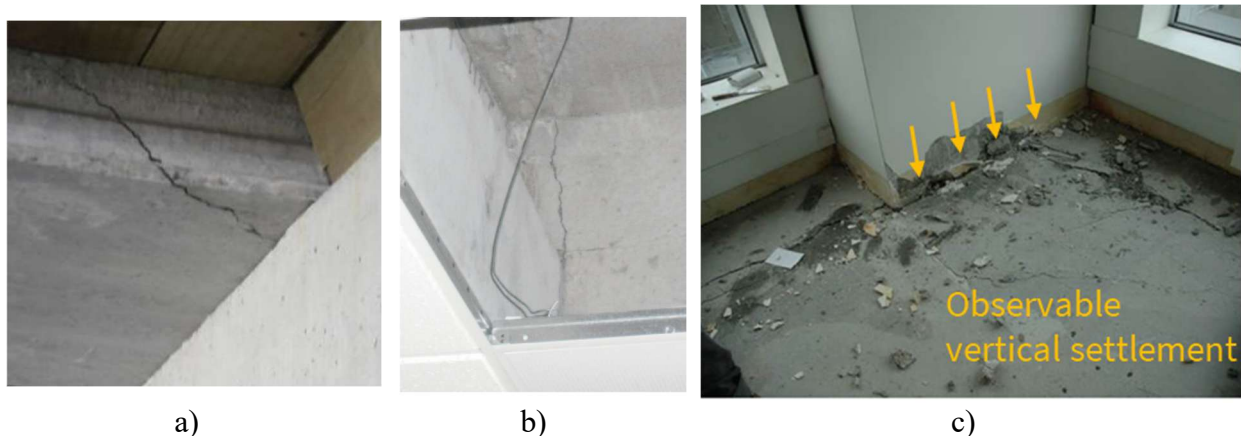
Examples of damage attributed to damage state 2b: a) hollow core section cracking through thickness near support (Kam et al. 2010); b) vertical cracking of double tee web at dapped connection (Corney et al. 2014); c) connection damage of flange-hung double tee with vertical settlement indicating unseating is possible (Kam et al. 2011)
